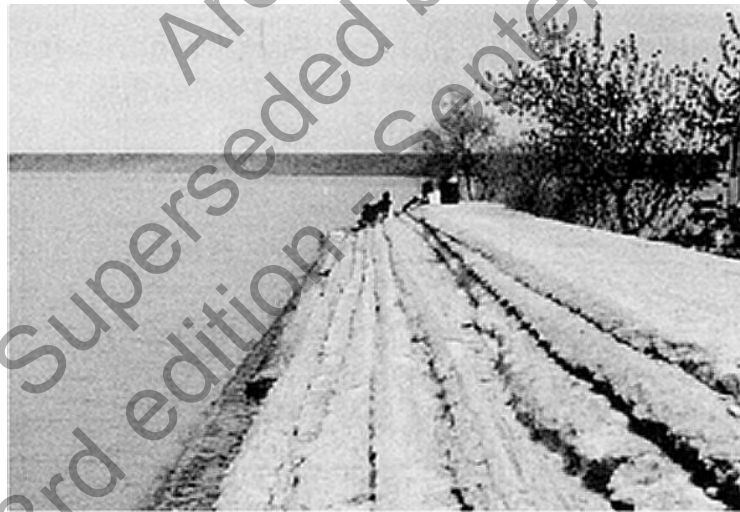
Stair step facing on Bonny Reservoir, Colorado after 30 years (PCA).
